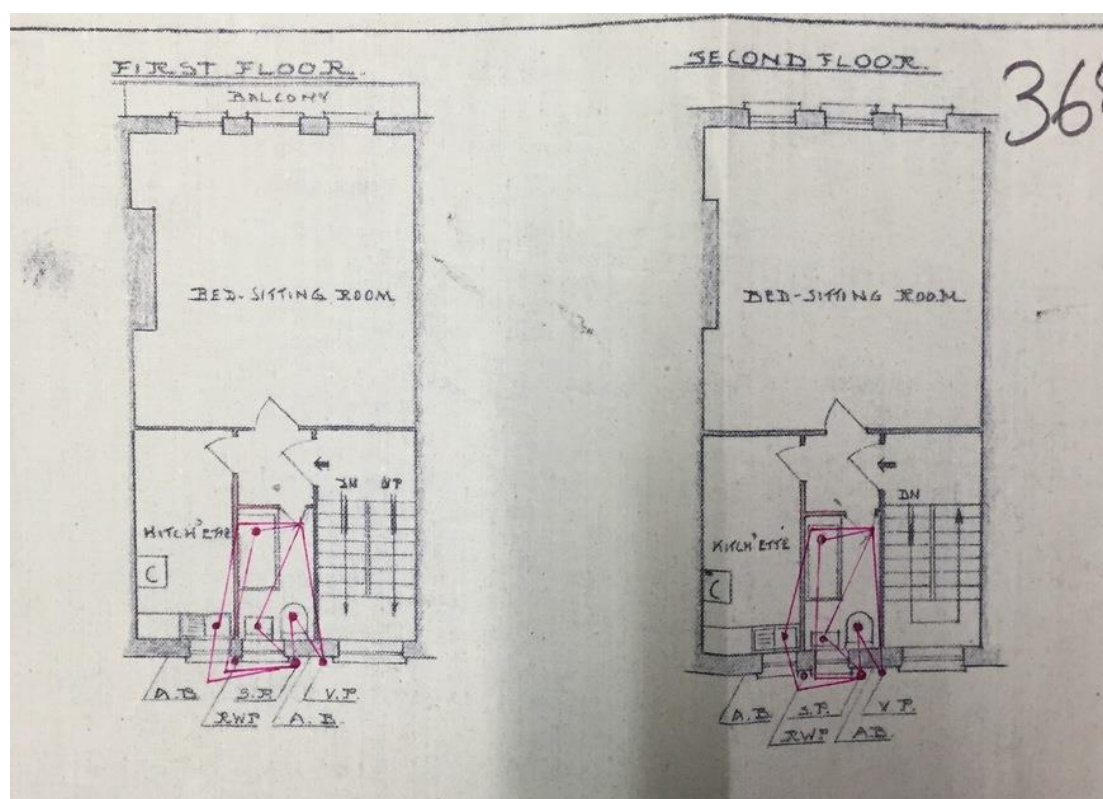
Drainage plans for 156 Kensington Park Road, first and second floors, 1959. Image courtesy of the RBKC Local Studies department.
